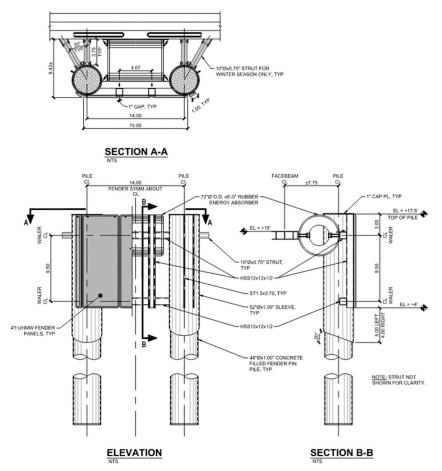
Permanent Fender Panels – Plan and Elevation Views
